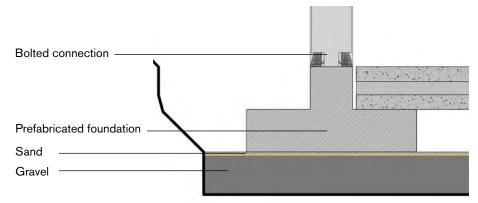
Prefabricated foundation section detail, Own illustration
